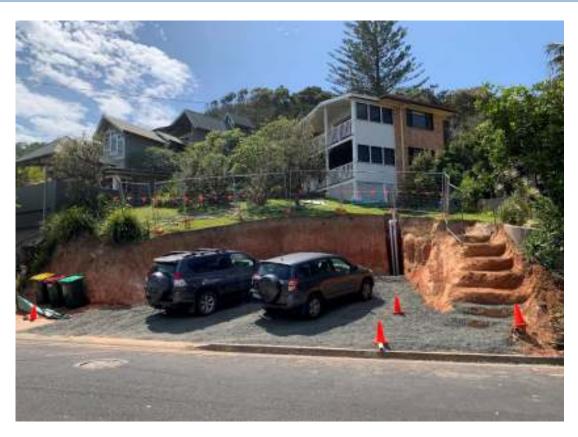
Excavation prior to being retained by sandstone block retaining wall. Excavation exposes natural clay soil in upper section and weathered rock in the base.
